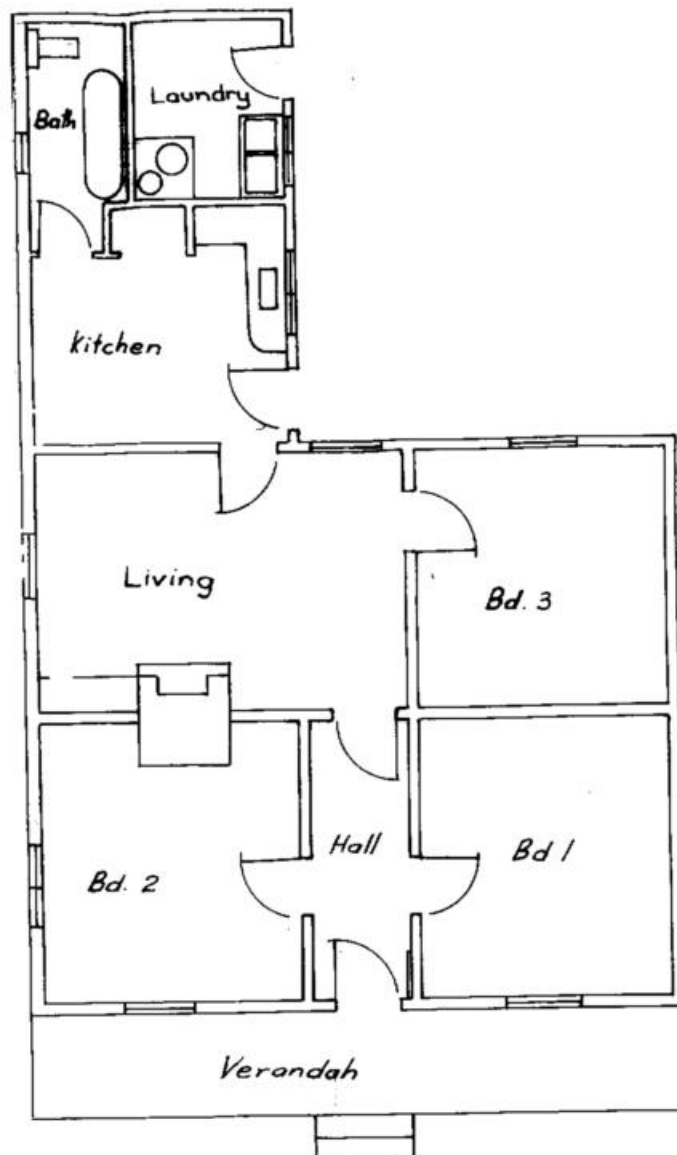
Layout of a 1905 villa, as drafted in 1961.\
